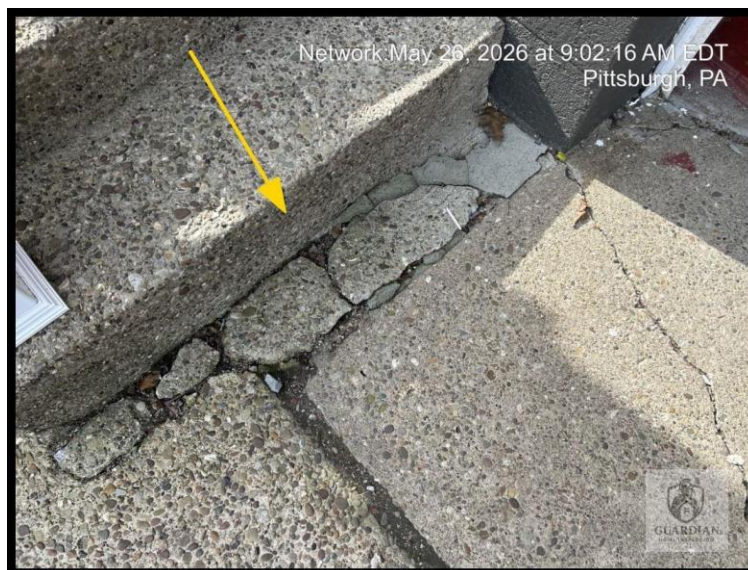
Minor surface deterioration/spalling was observed at the bottom of the front exterior stairway along the front exterior wall.
